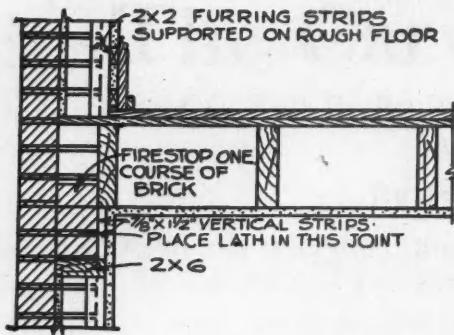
Section at Second Floor Joist Level. Joists parallel to wall.
